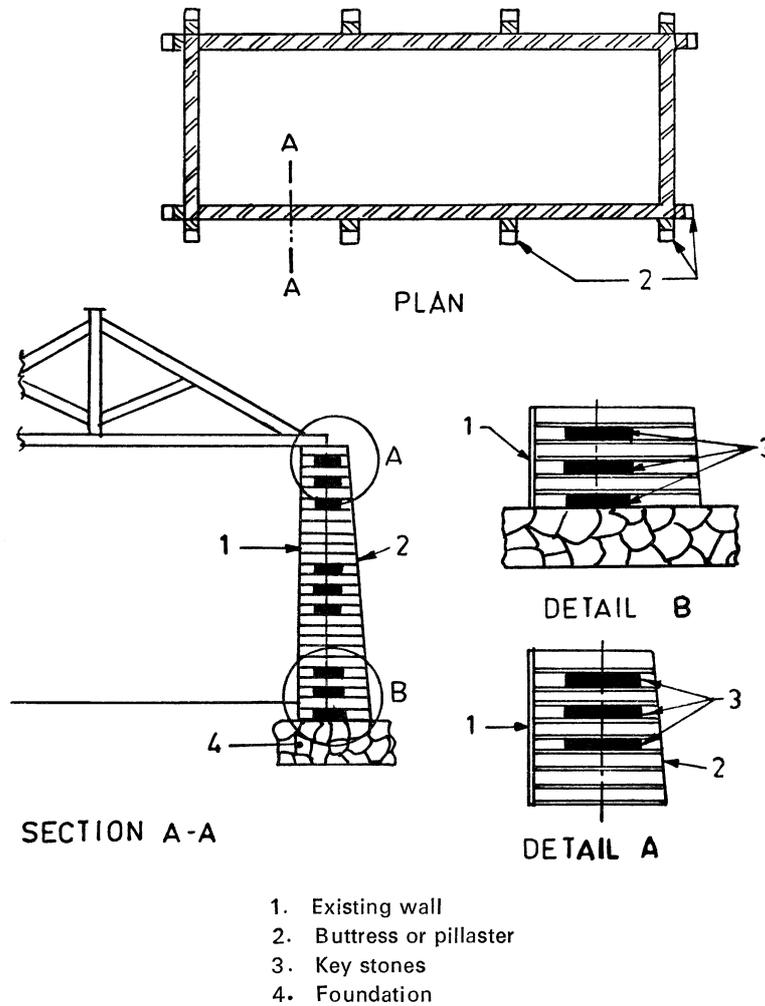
STRENGTHENING OF LONG WALLS BY BUTTRESSES
